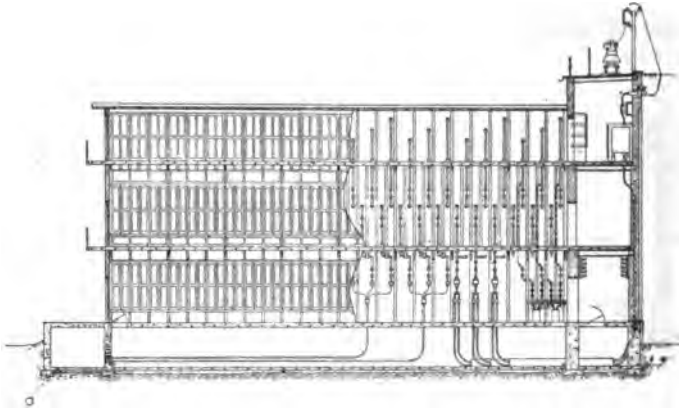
CROSS-SECTION THROUGH ONE BAY OF DISTRIBUTING STATION—SHOWING ELEVATION OF BUS AND SWITCH STRUCTURE
